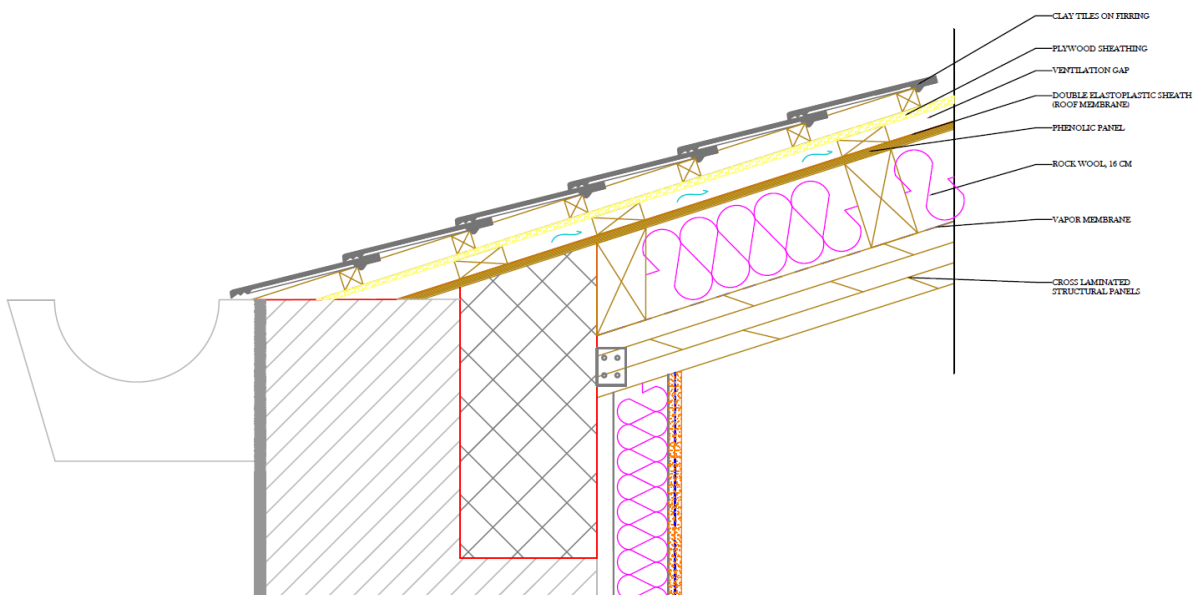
Building 12 Schematic Drawing 4-Wall to Roof Section
